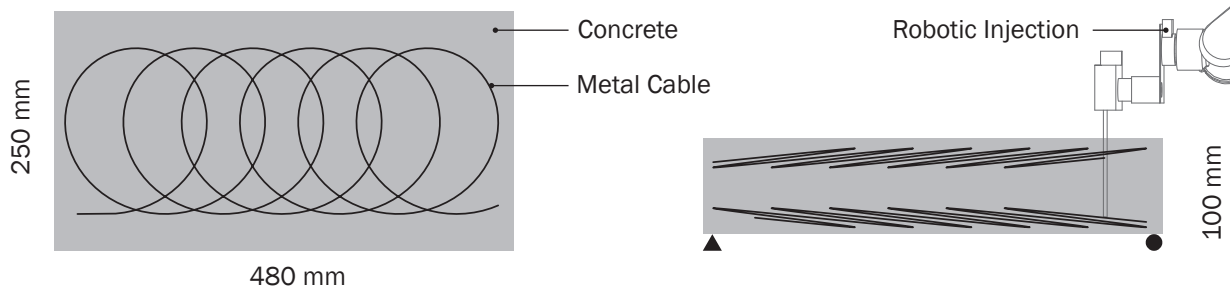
Cable printing design inside of concrete slab: Plan drawing (Left), Section Drawing (Right).
